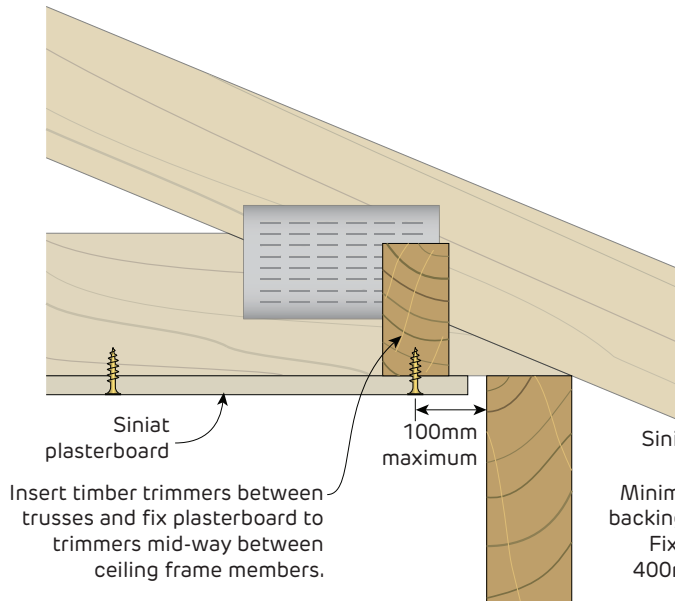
Plasterboard Ceiling Fixed to Roof Truss
